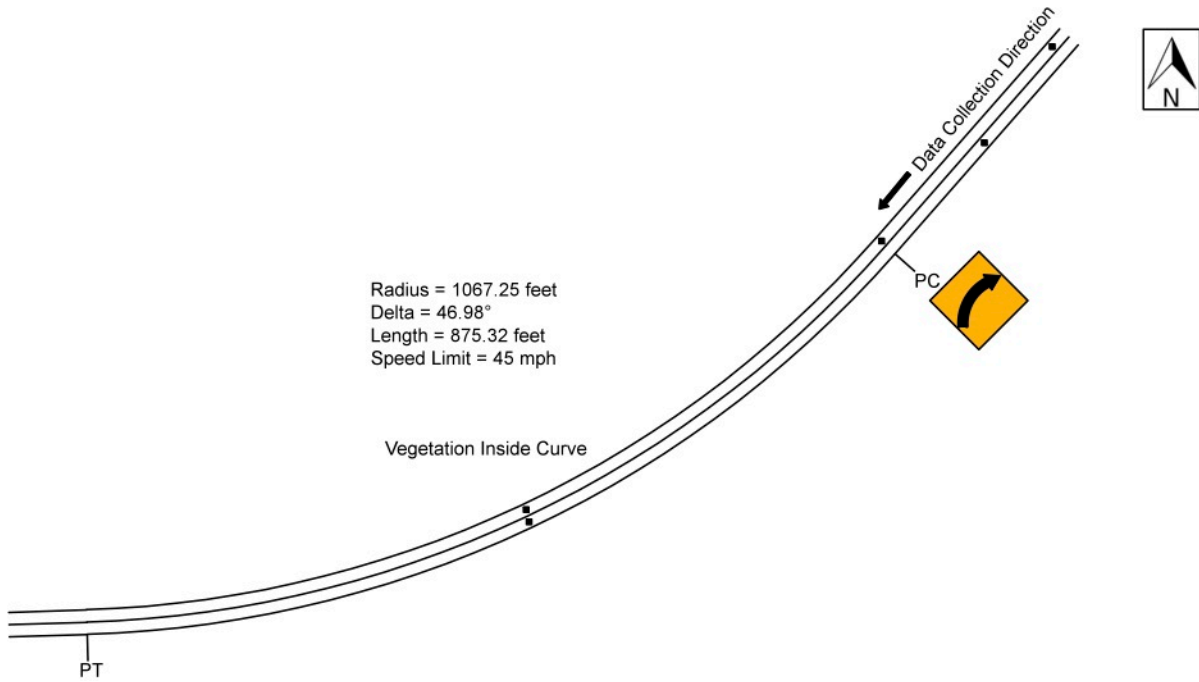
Diagram. Geometric layout of southbound Diamond Bar Road in the before period (not to scale).
